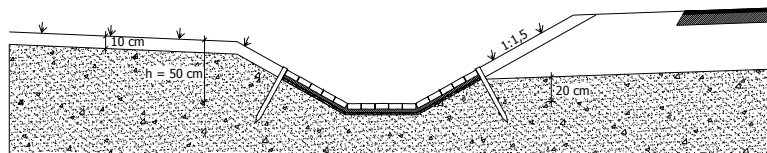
Protection of cross-section of trapezoidal ditch with paving stones placed onto layers of cement mortar and sand, and with poles for longitudinal falls  $J > 10\%$
